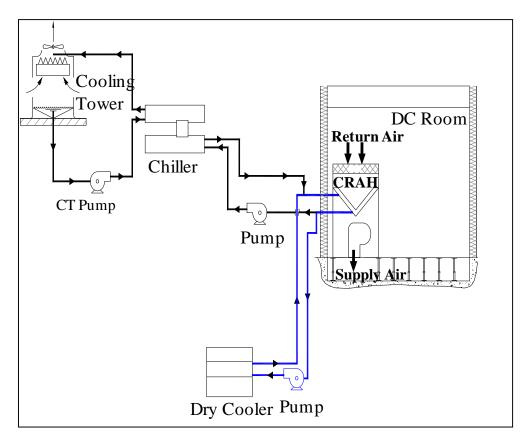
Schematic for the cooling system with dry cooler, a mechanical chiller and a cooling tower.
